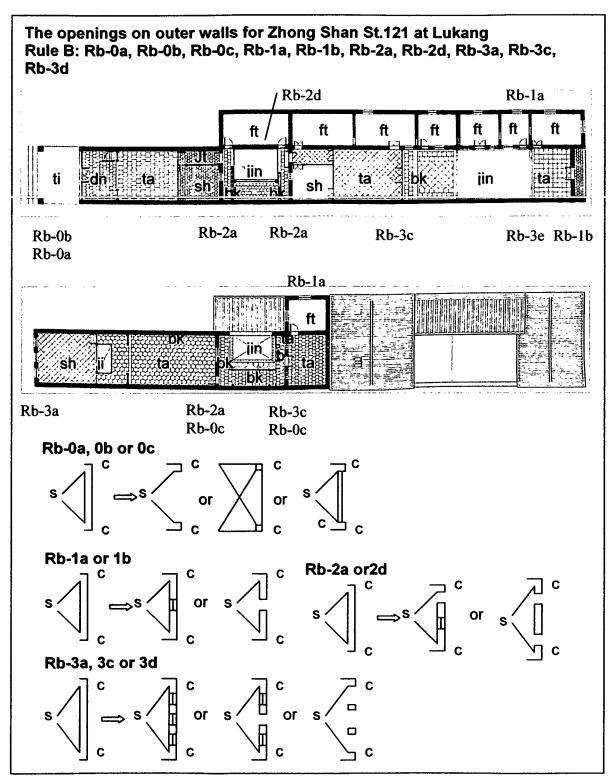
27 Rule B for illustrating openings on outer walls of floor plans at Zhong Shan St.121 in Lukang
